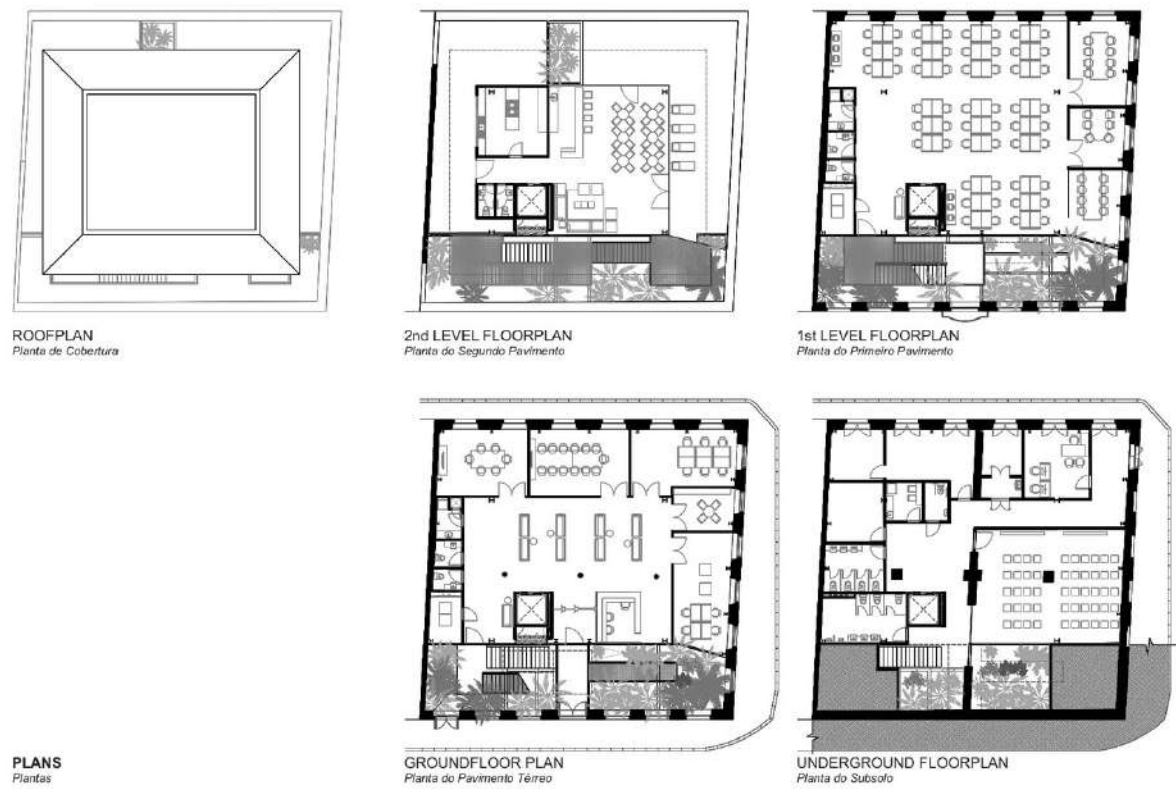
Cassina Innovation House - plans. Source: ArchDaily.
